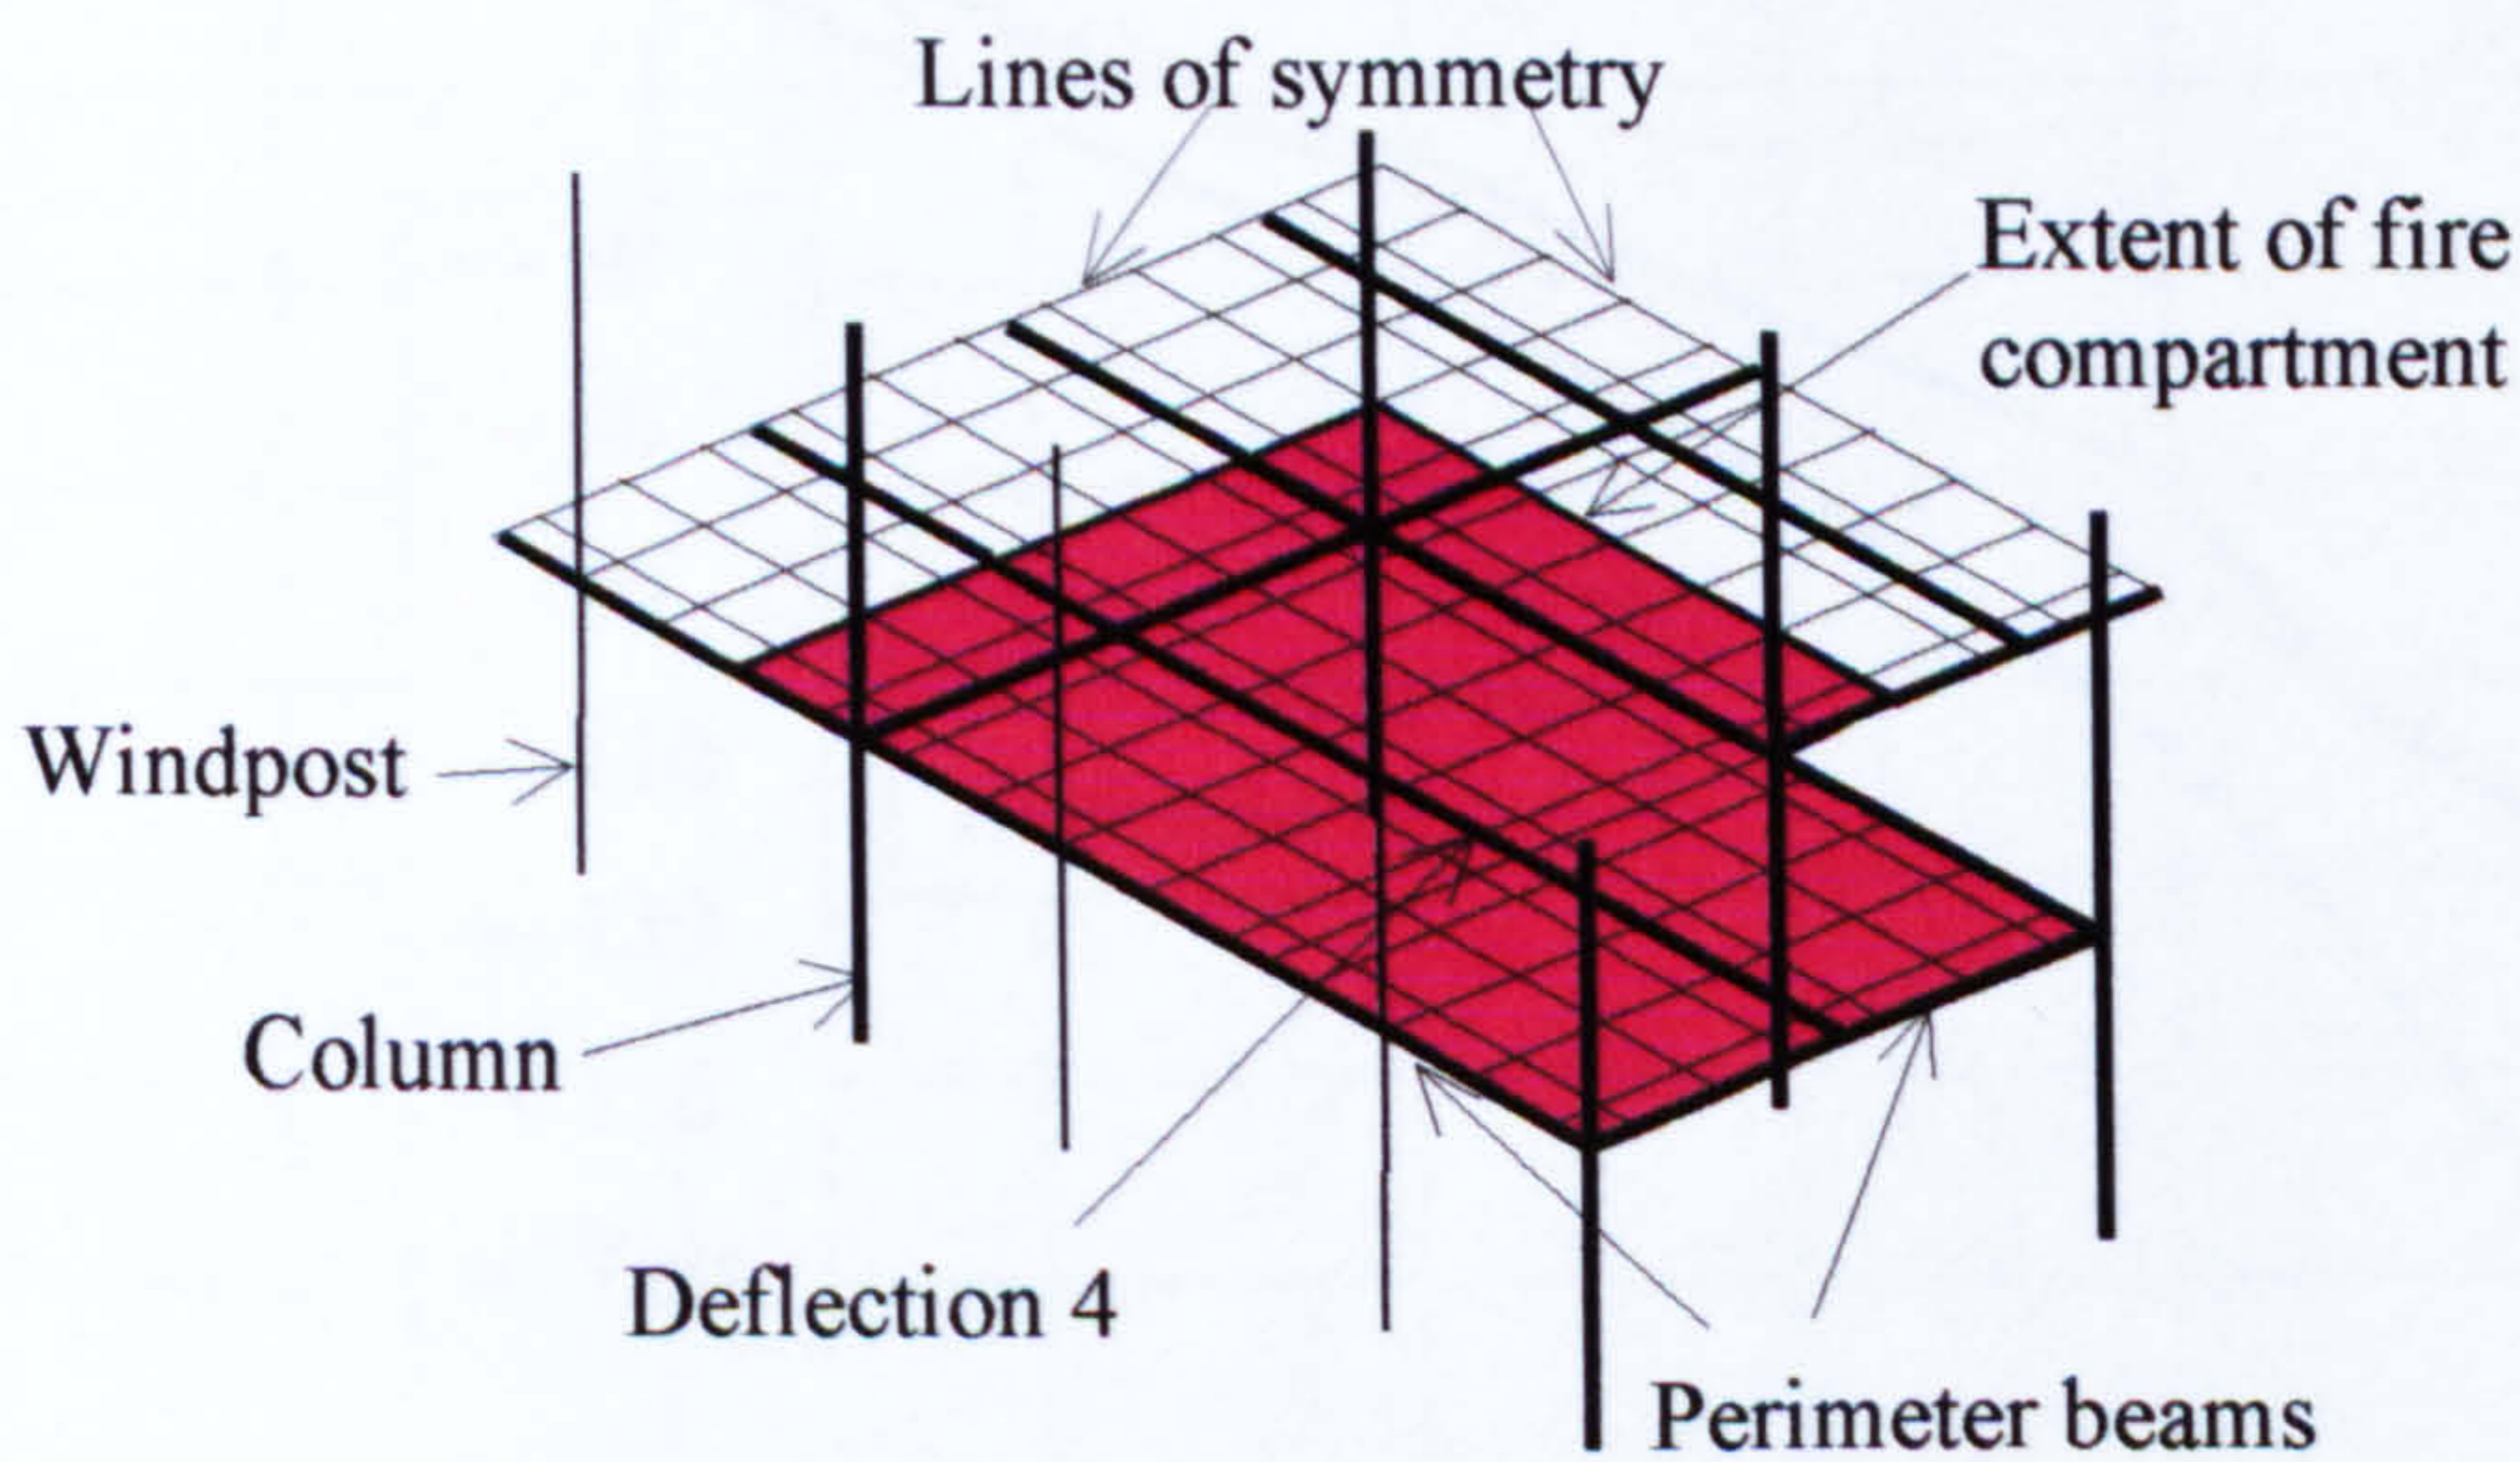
Finite element mesh arrangement for the British Steel corner test.
